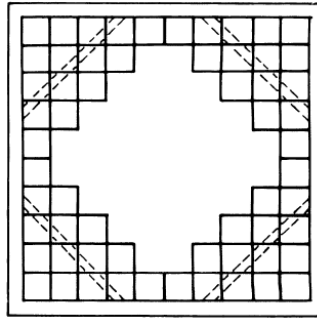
Shell Plan showing corner ties and assembly of corner panels [74]
